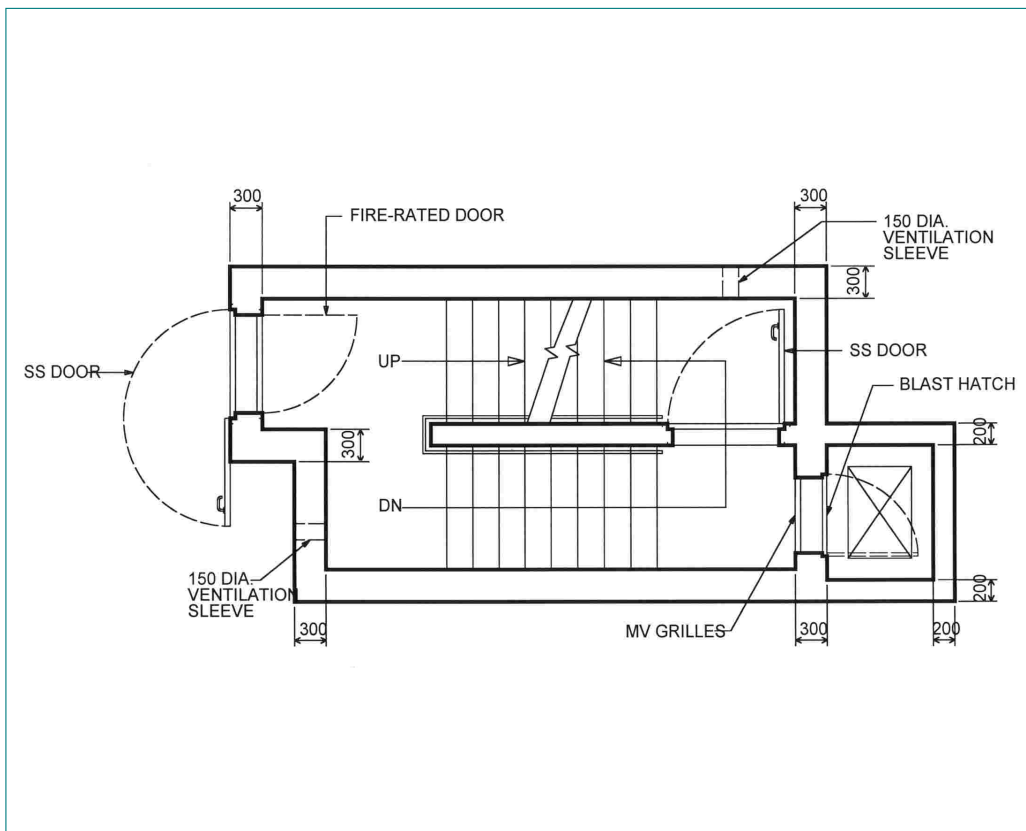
Typical layout plan of a staircase storey shelter
